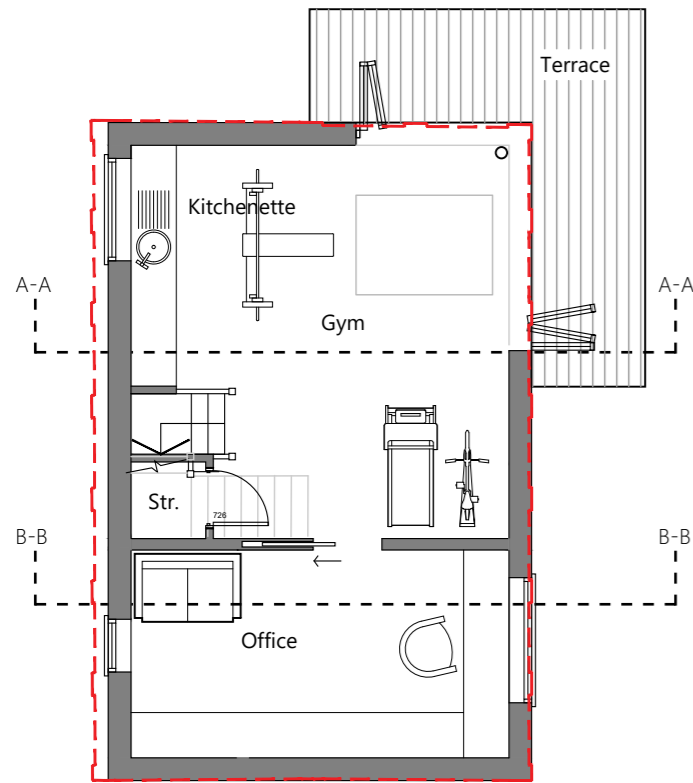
Proposed ground floor plan, showing how proposals will fit within the footprint of existing garage and will be the same orientation (in red).
